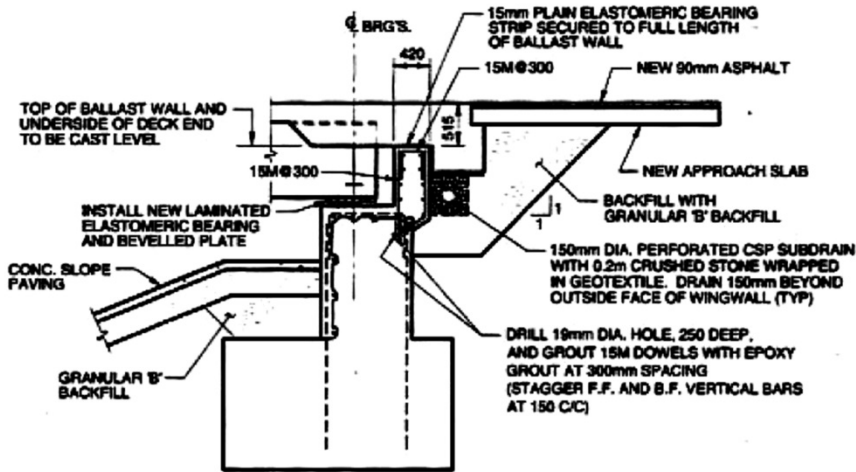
Semi-integral abutment configuration: steel girder with concrete deck and deck overhanging the ballast wall (expansion length less than 40m) (Husain, 2004)
